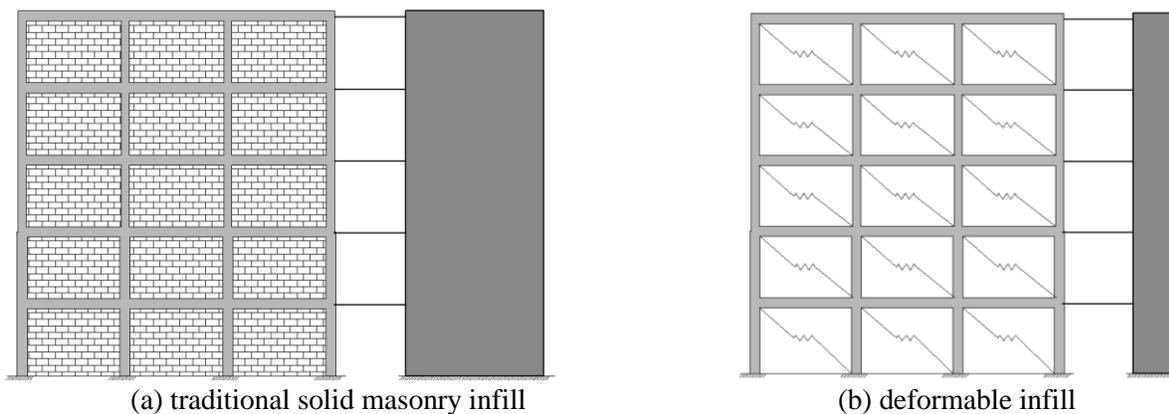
Reduction of the additional bracing system size and stiffness for the retrofit of existing RC building, allowed by the downgrade of the infills.
